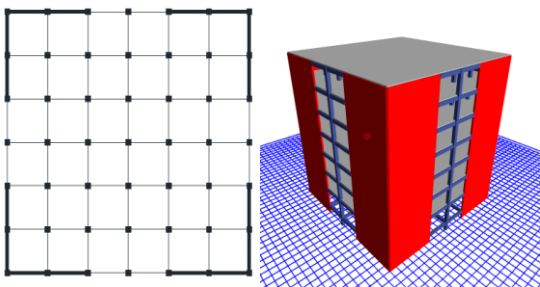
Building with L-shape shear walls on plain and sloping ground
